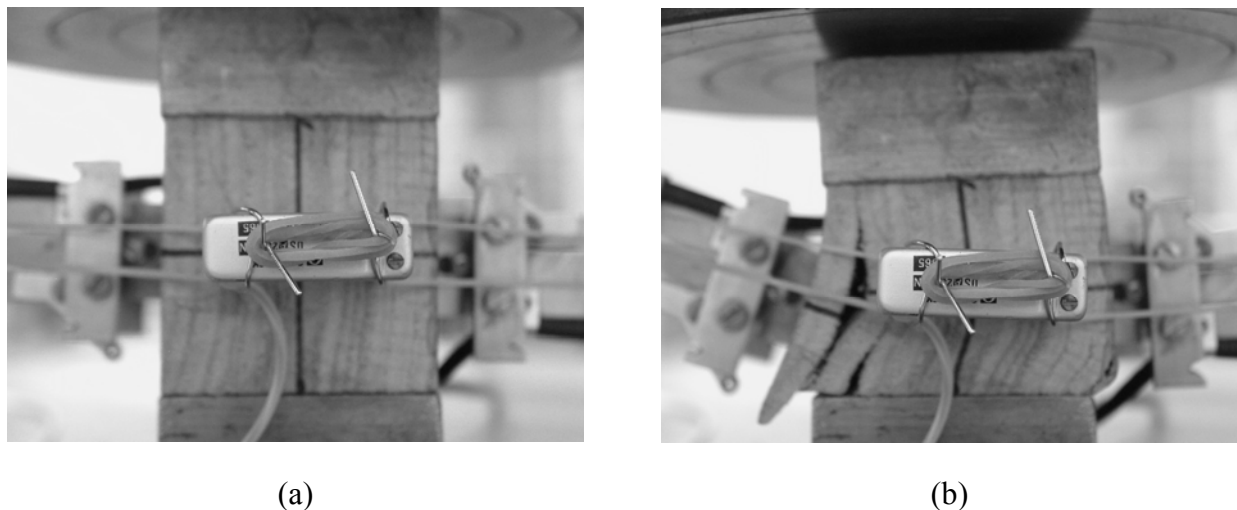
Typical tangential behaviour: (a) unloaded test specimen, and (b) test specimen at failure.
